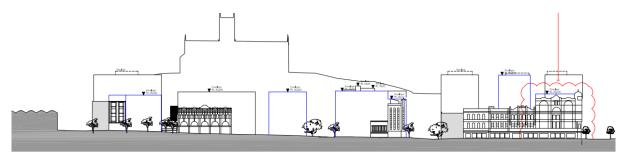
Hunter Street elevation with modified building envelope for the former David Jones building Block 1 (Stage1) with retained heritage facades (Source: SJB Architects)
